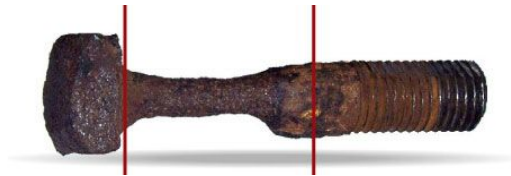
A rusted bell head bolt, likely to fail. Marked area indicates hidden part of bolt.⁵⁹
